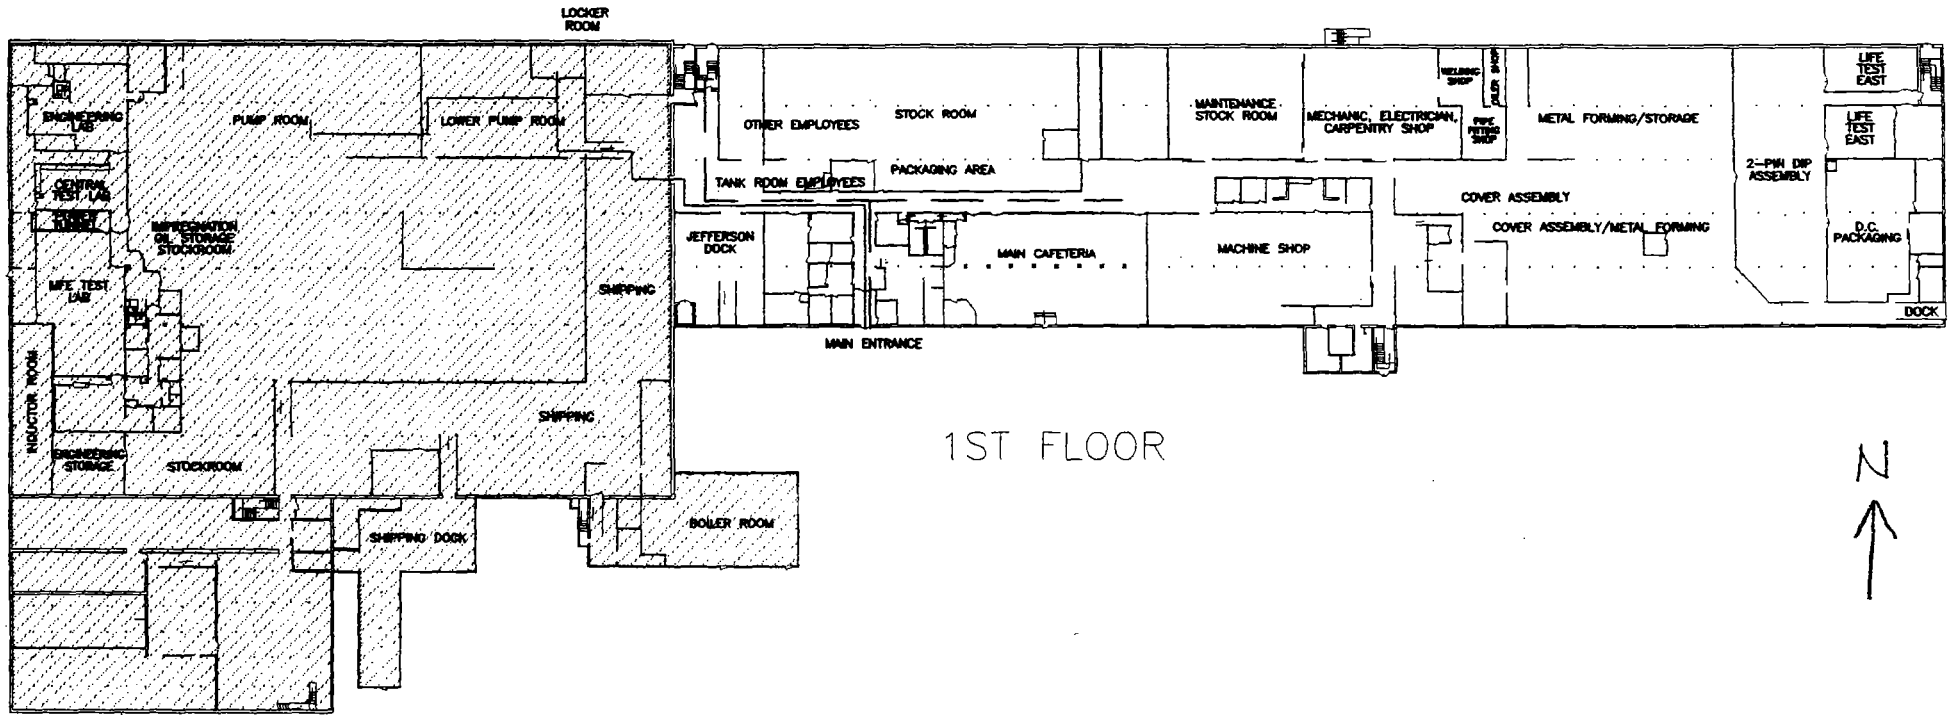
Area of the Aerovox site covered with the hydraulic asphalt concrete (HAC) cap
